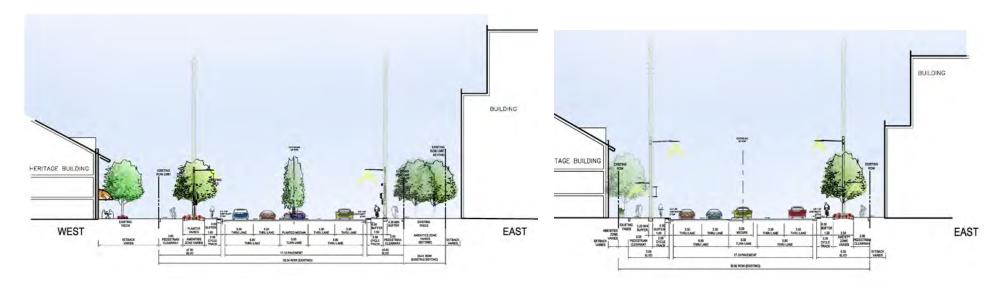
Section E-E Old Thornhill- Approach to Intersection
